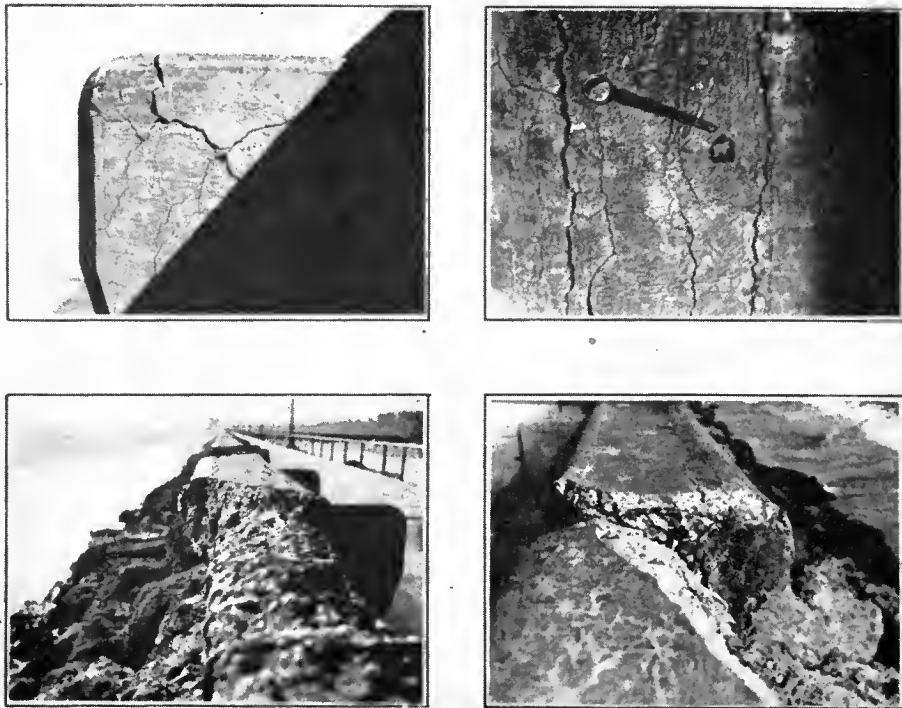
Cracks in sea wall at Santa Barbara
